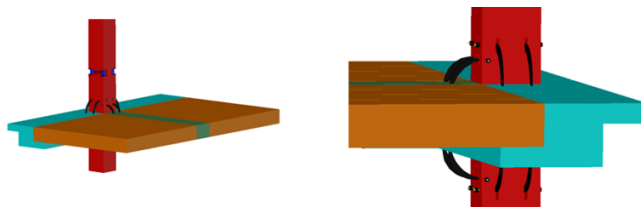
Non-monolithic column-to-column connection and beam-to-column solution.
